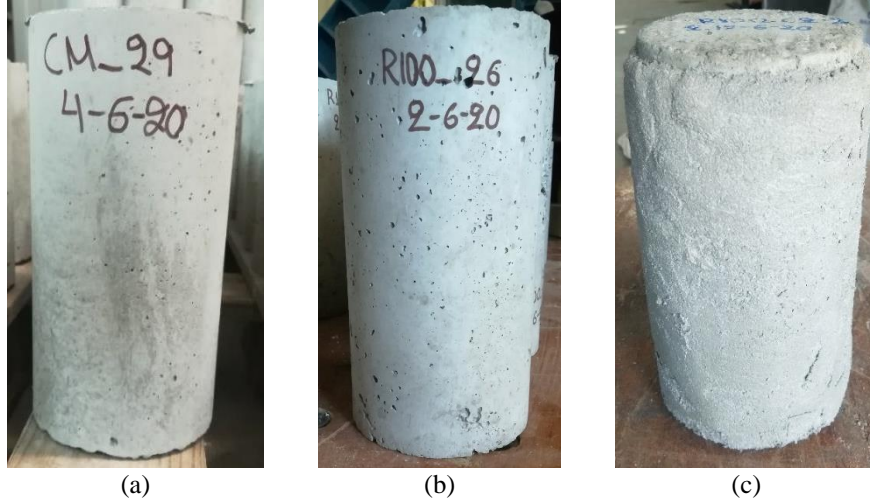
(a) Conventional concrete cylinder, (b) rubberised concrete and (c) confined rubberised concrete cylinder using 2 layers of TRM.
